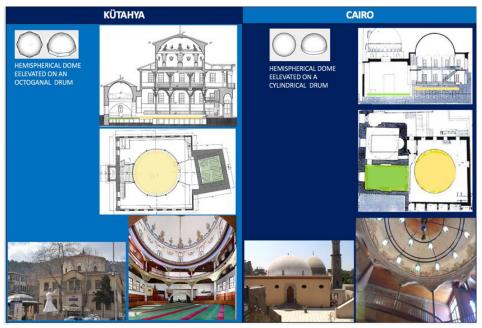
(a) Kütahya- Section and plan drawings [1] Exterior and interior photos [9] (b) Cairo- Section and plan drawings [17], Exterior and interior photos [10]
